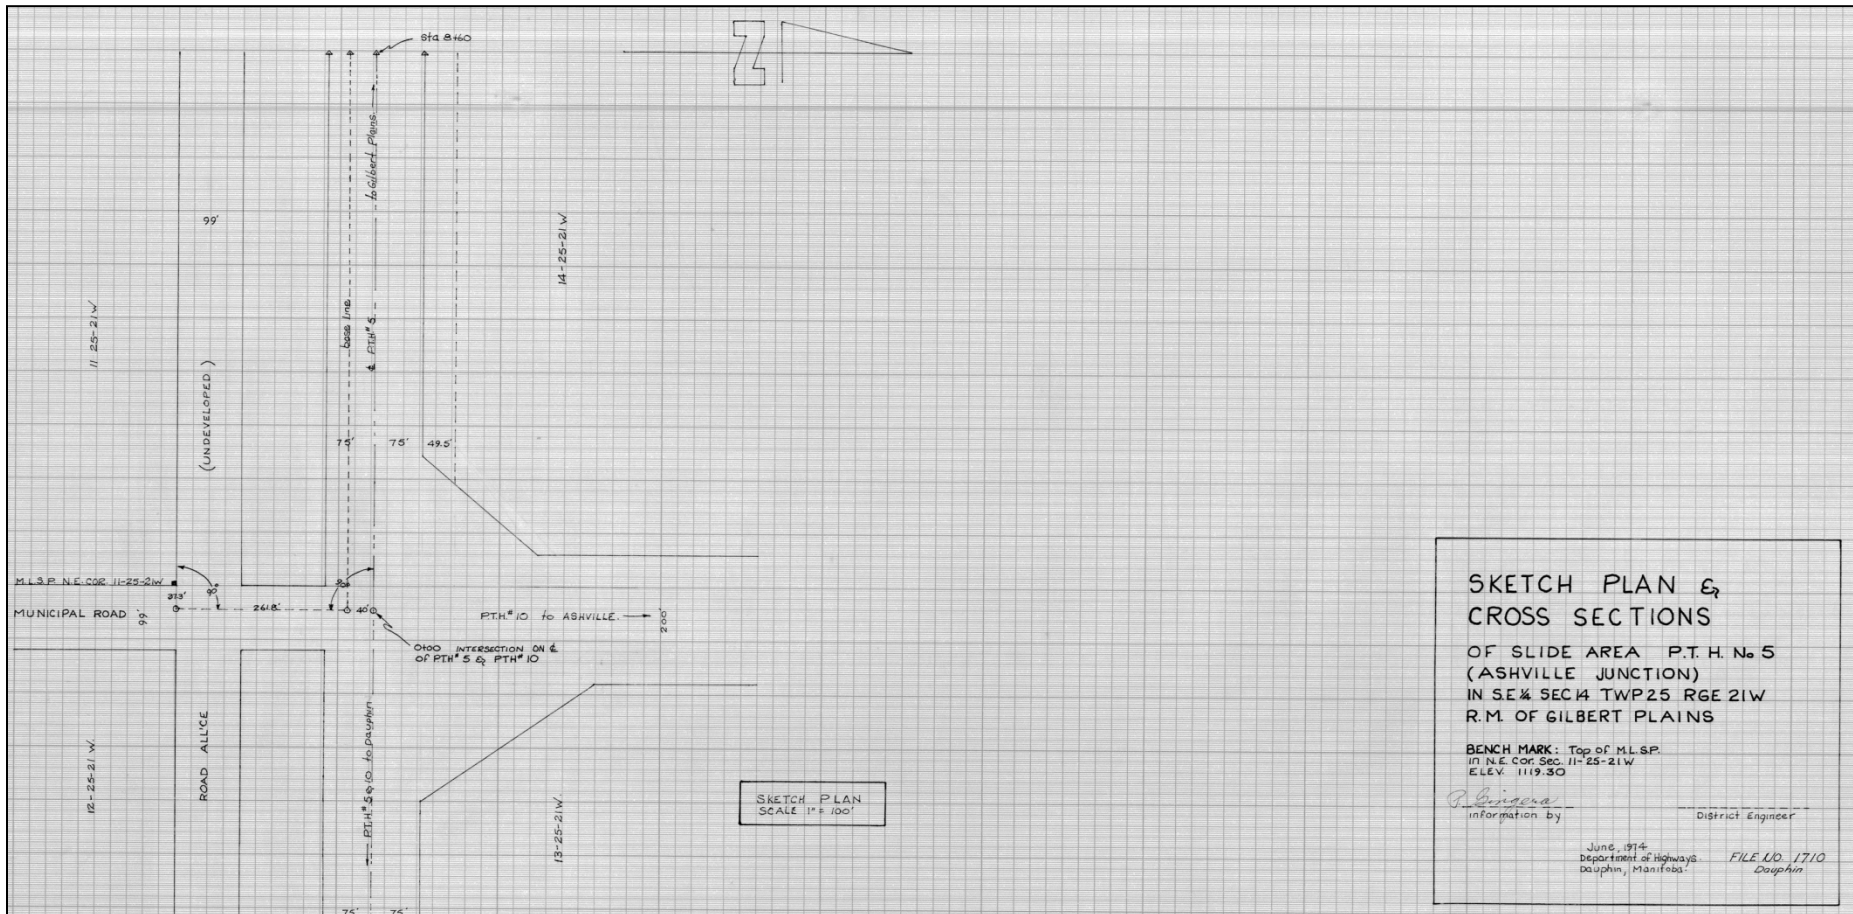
1974 Ashville Junction Site Plan (Note - scale is in feet)
